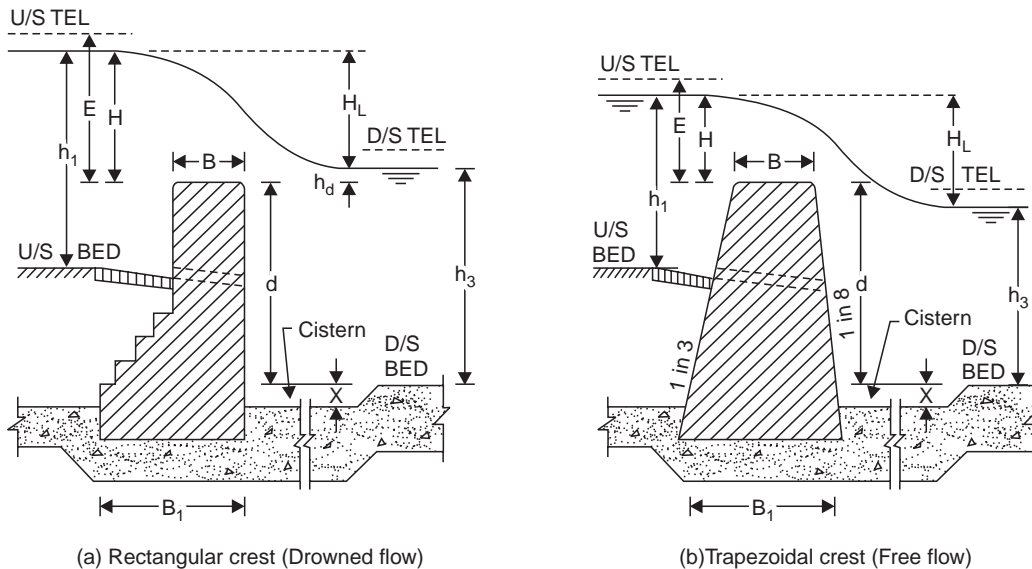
Types of cross-sections of crest for Sarda fall
